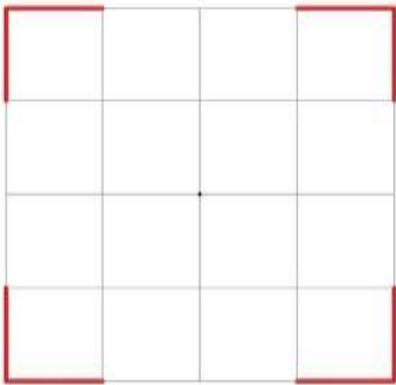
(a) Structural Plan for Inverted V-Braced RC Frame (Model-5)
